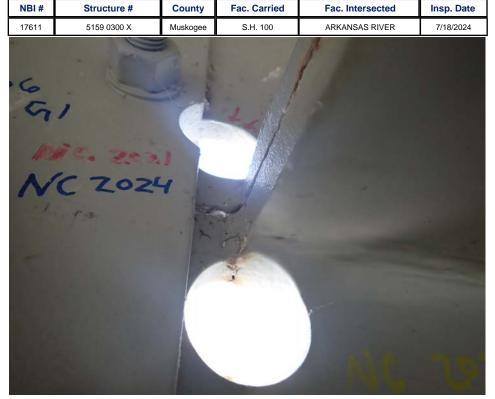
Looking southeast at span 5, girder 1 at the field splice near floor beam 5. Note: 5/8 inch-long crack in the inboard face at the horizontal web splice termination, no change.
